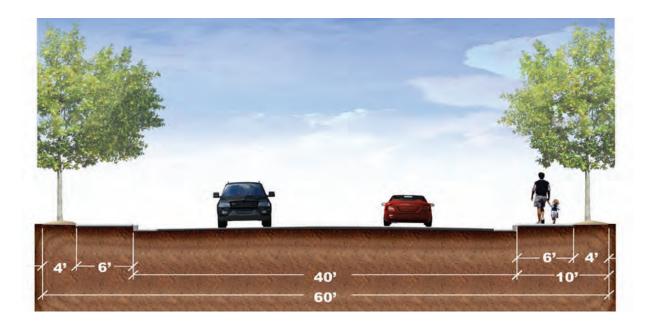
| Themed Road(s) - F Section (60' R.O.W.) Date Palm Road
